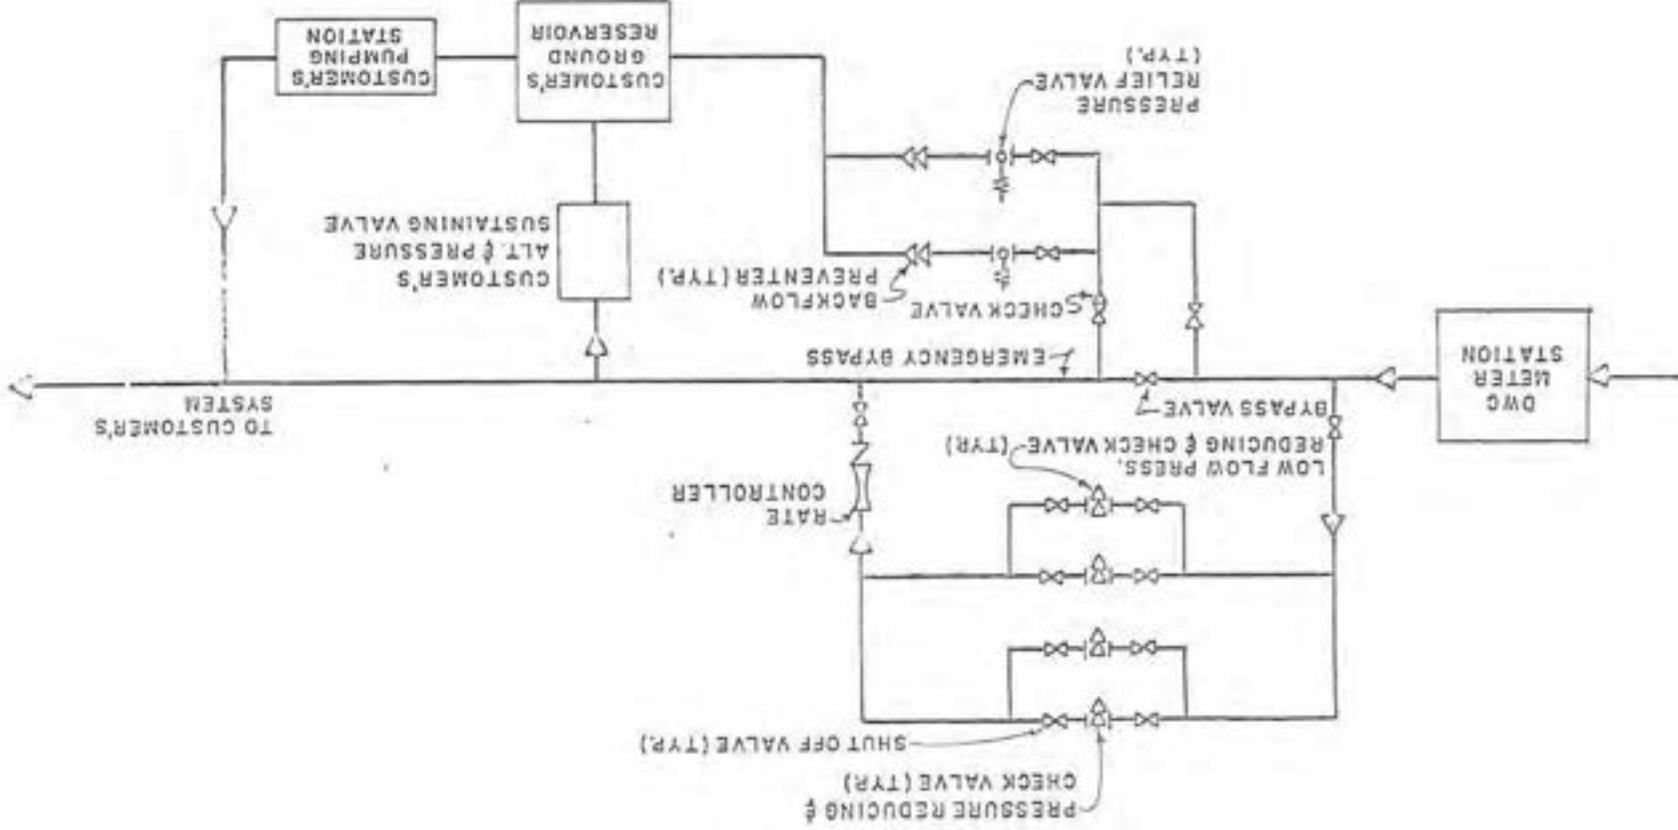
YORKVILLE UNIT SYSTEM CONNECTION FACILITIES
